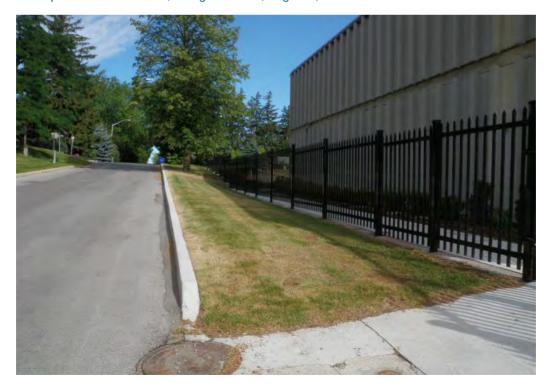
Area of disturbance: paved asphalt road surface and concrete walkway, graded boulevard, facing northwest, August 5, 2015.
